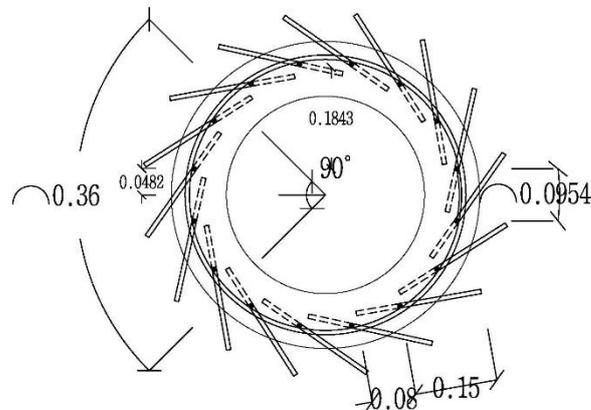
Reinforcement details of pocket of specimens (S-PE-40 , R-X-48 , R-PE-48 , R-PE-32) at elevation
